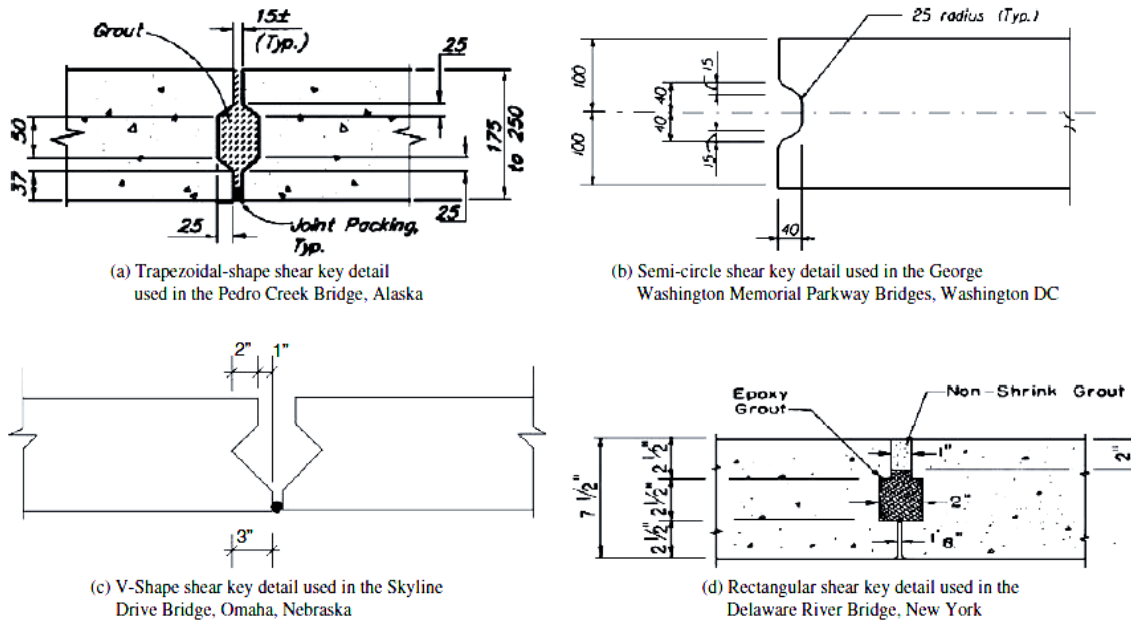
Transverse Joint Detailing for Precast Deck Panel Bridges in Alaska
